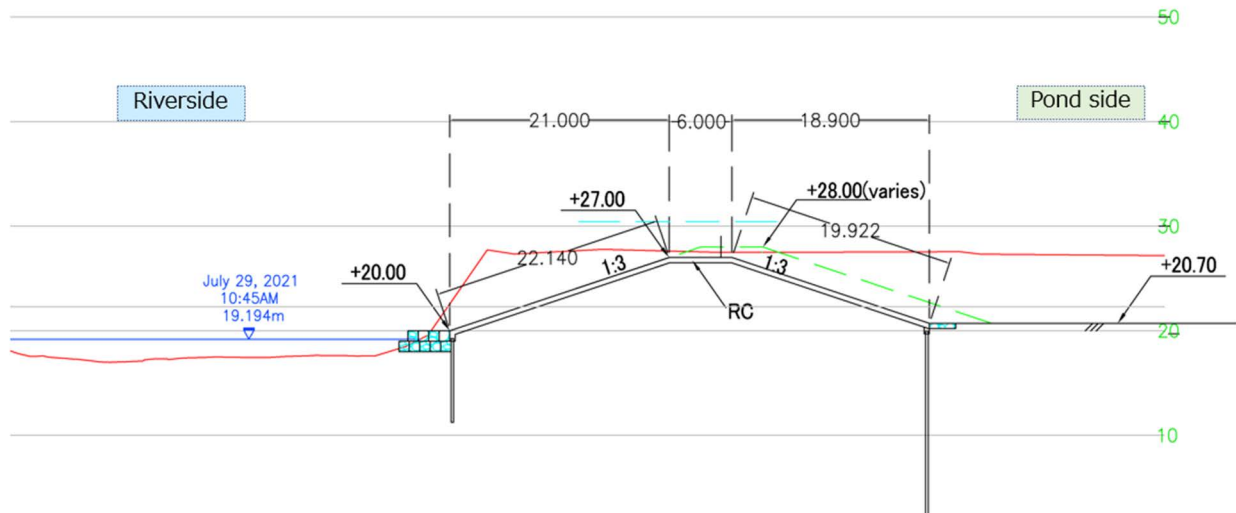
Standard Cross Section of Surrounding Levee at Retarding Pond: RP08 (Where the crest is higher than existing ground)
